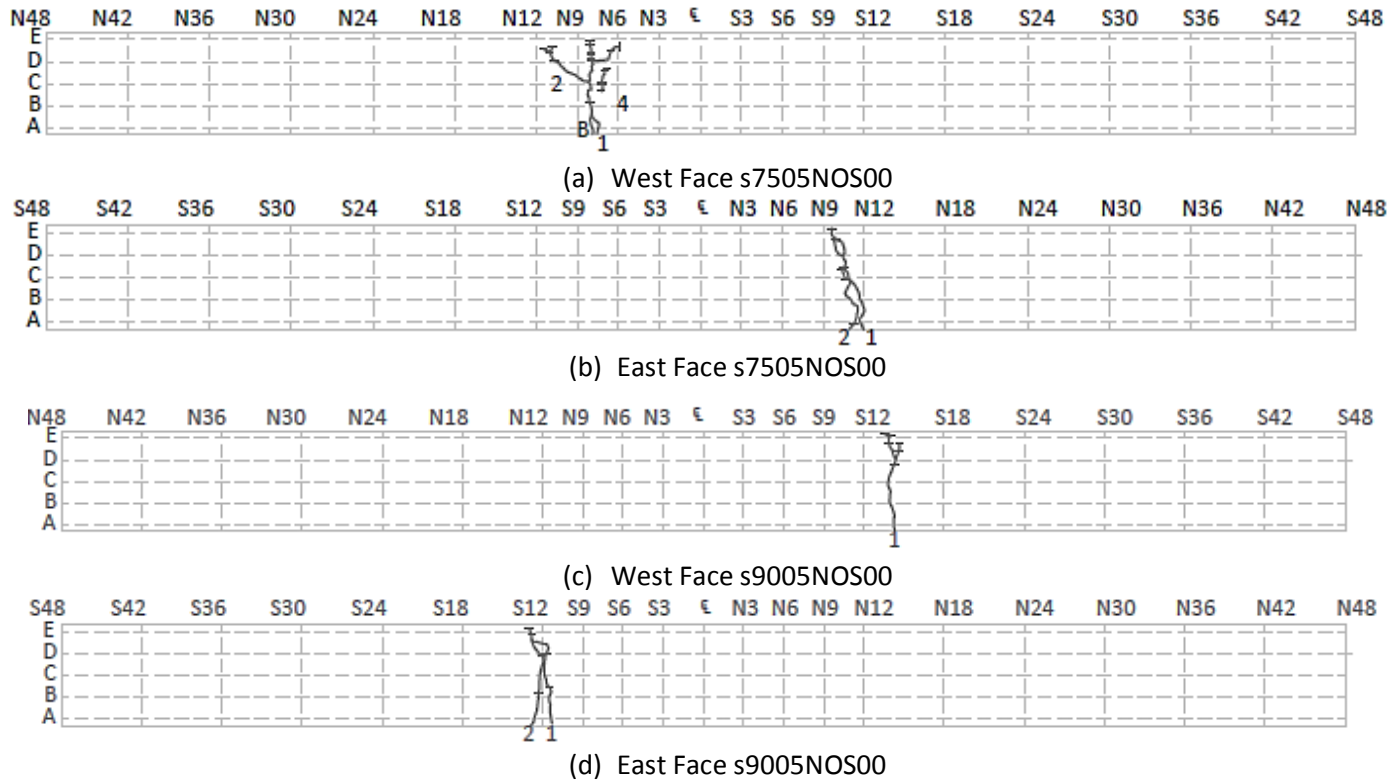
Crack Maps for Slab-Strip Specimens without Steel Reinforcement
